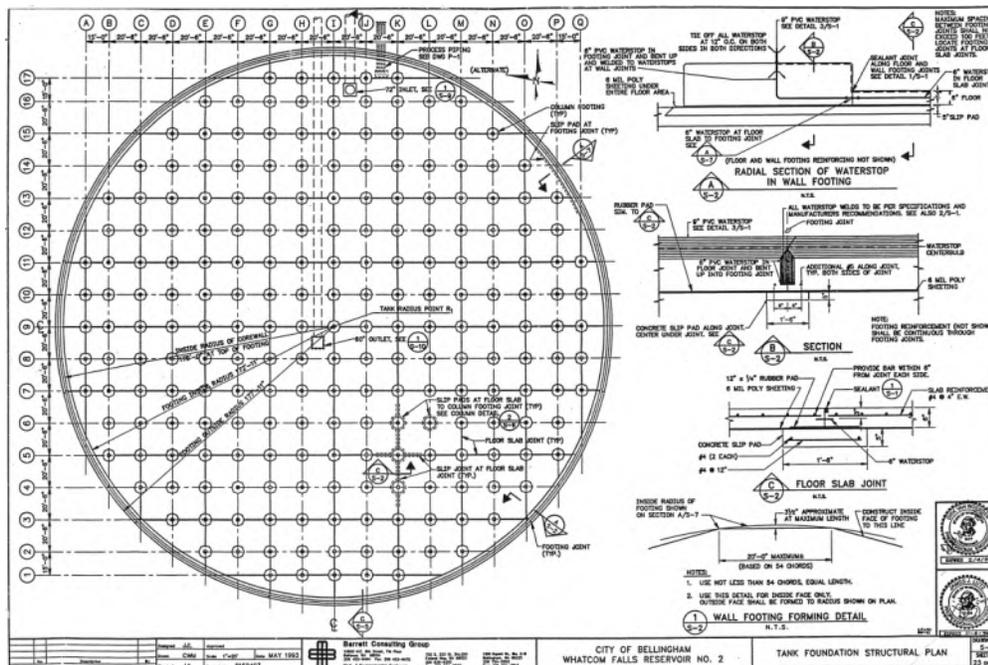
Whatcom Falls 2 - Structural Notes and Details
